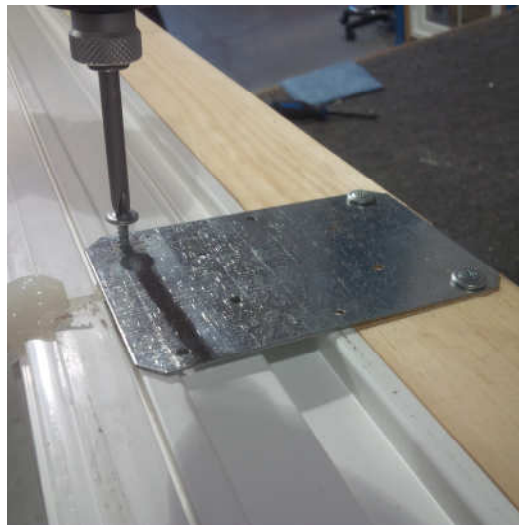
Attach mending plate to jamb extensions and vinyl frame using supplied screws. WARNING – DO NOT OVERTIGHTEN SCREWS INTO VINYL WALLS, AS THIS WILL CAUSE THE SCREWS TO STRIP.
